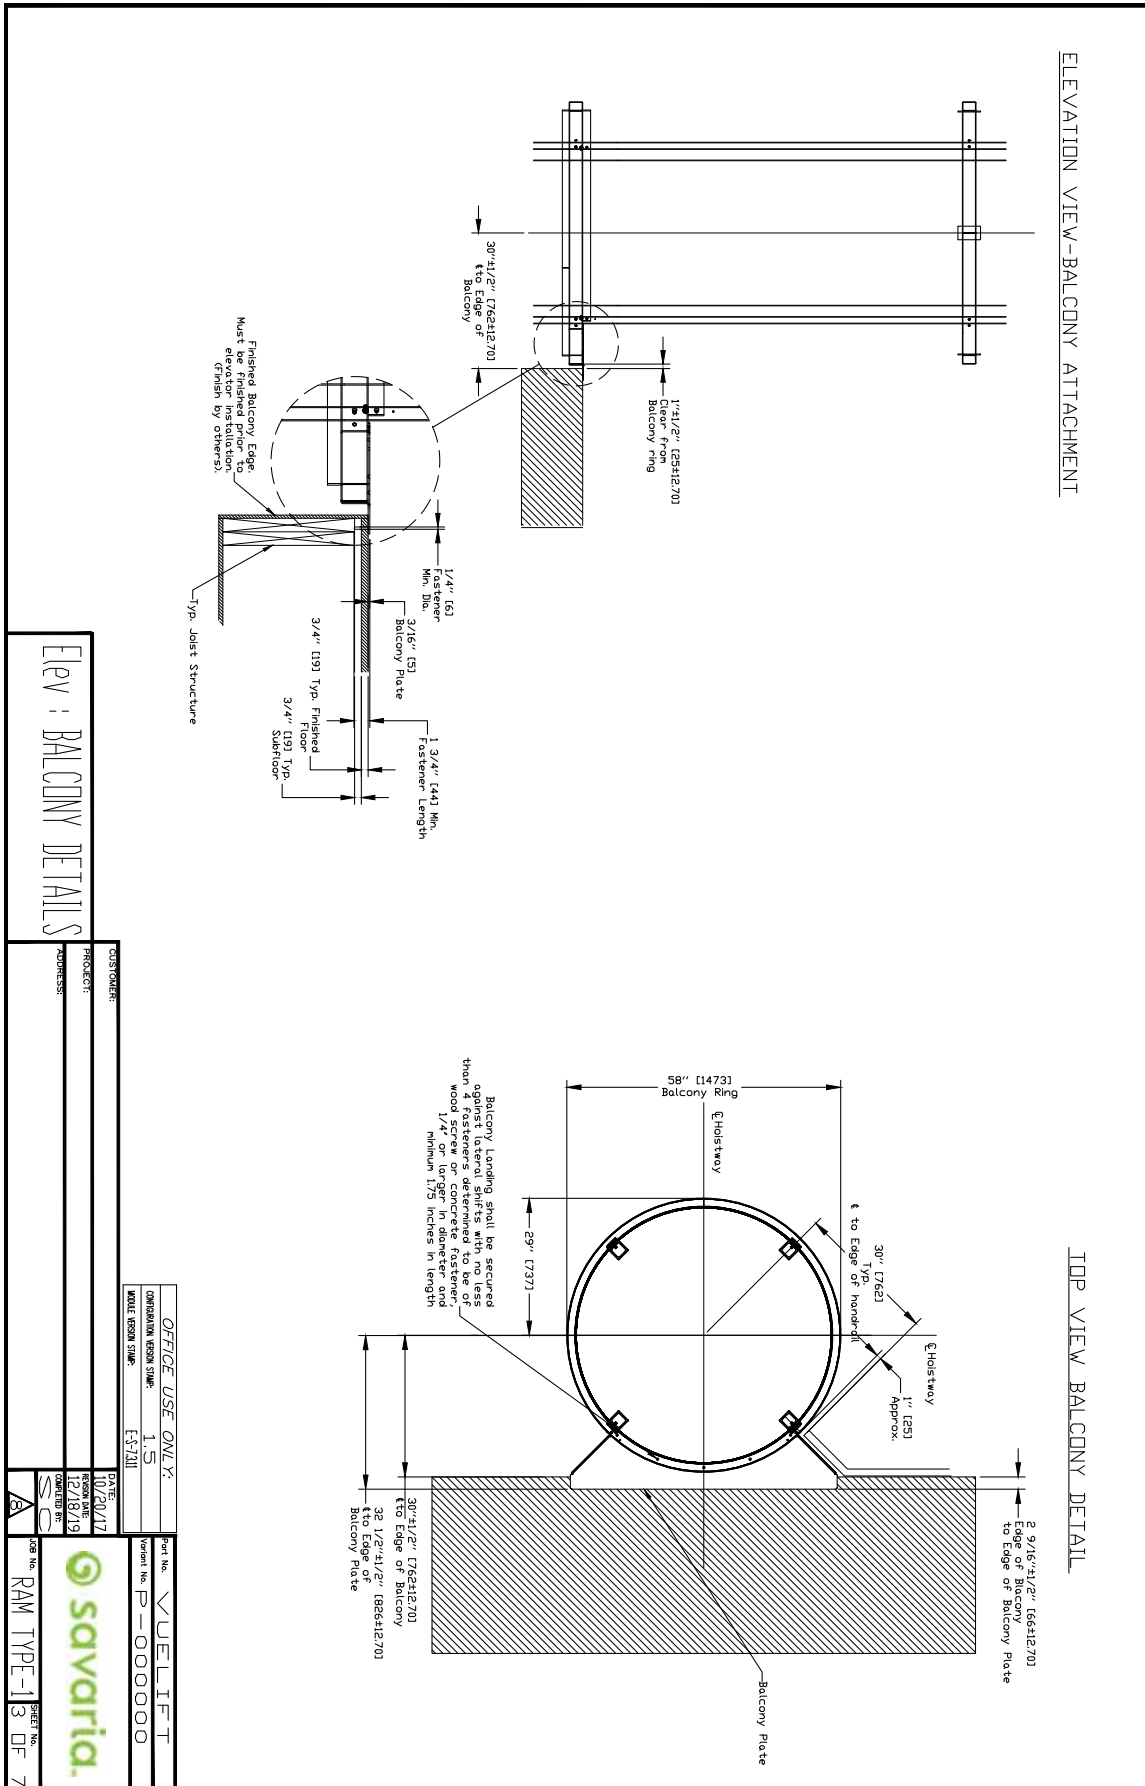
Balcony plate and handrail information - round acrylic (RAM)
